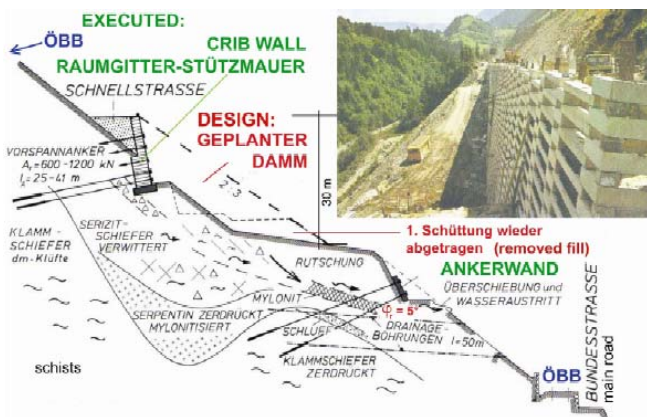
Crib walls in unstable slopes, locally tied back with prestressed anchors – up to ca. 40 m height. Example for an emergency re-design of an embankment to a tied back crib wall in the early construction phase when already the first small fill caused slope movements that threatened the railway lines (ÖBB) downhill and uphill. Locally only $\phi_r = 5^\circ$ in mylonites.
